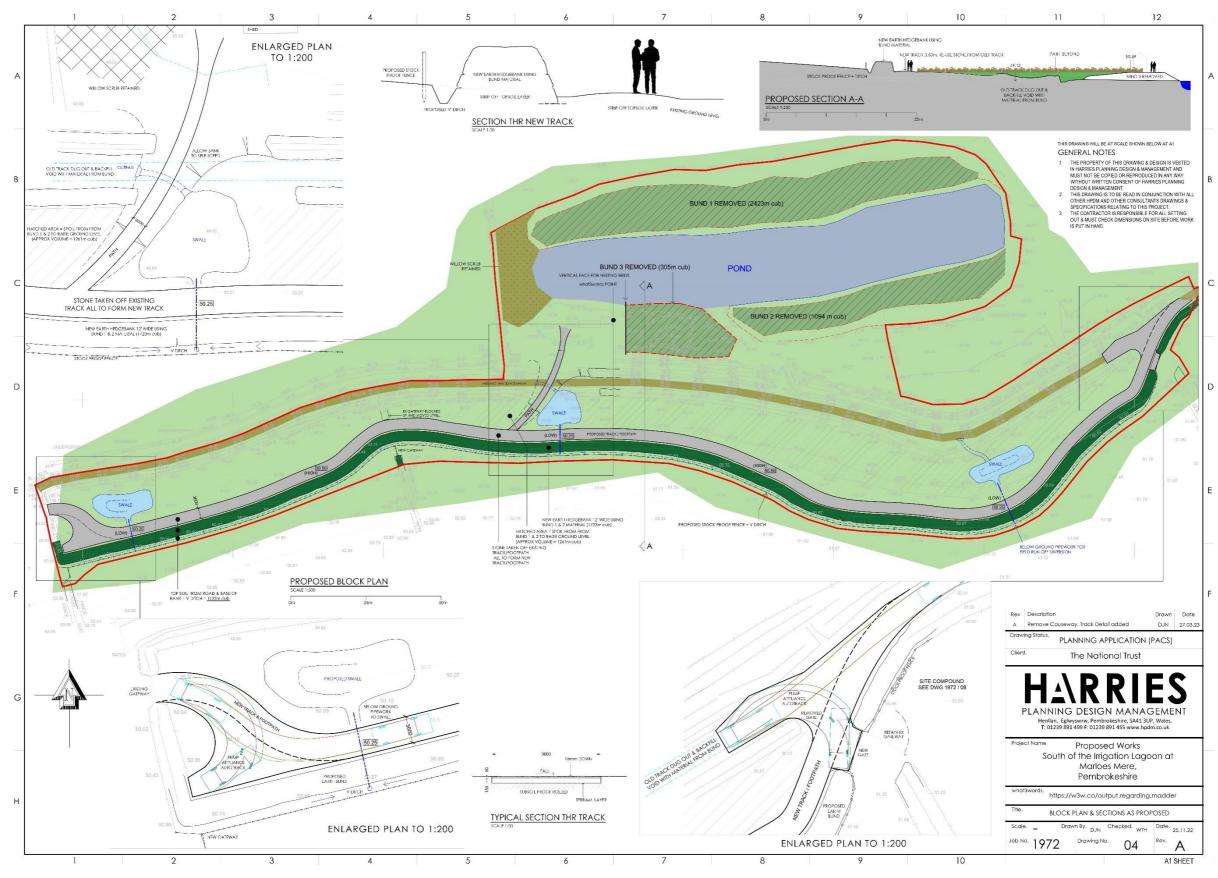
Proposed block plan, showing the development layout and details. Plan provided by the client, not reproduced to scale.
